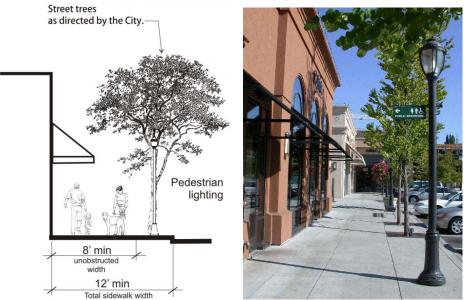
B.2.c Left: Illustration of requirements for a building front facing a parking area. Right: Example of a successful pedestrian sidewalk between parking lot and storefront.
